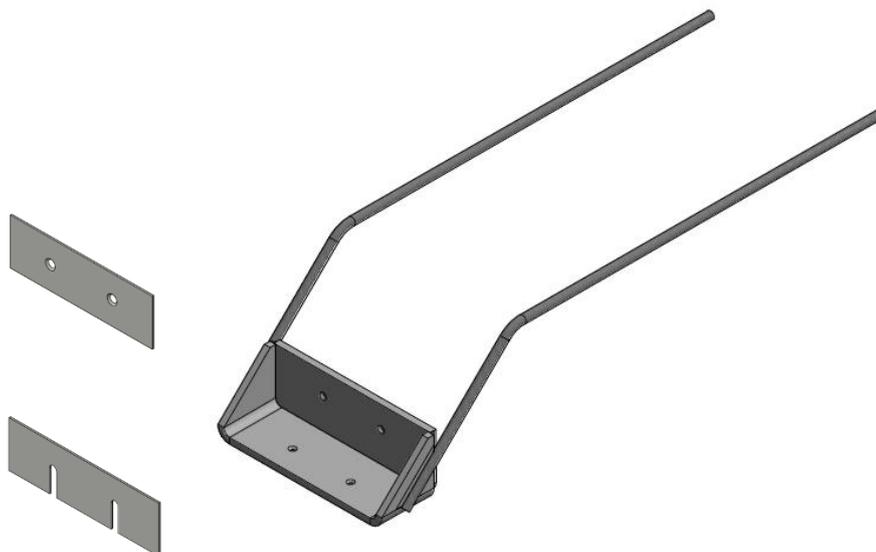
Steel bracket, slab side with associated tolerance plates
